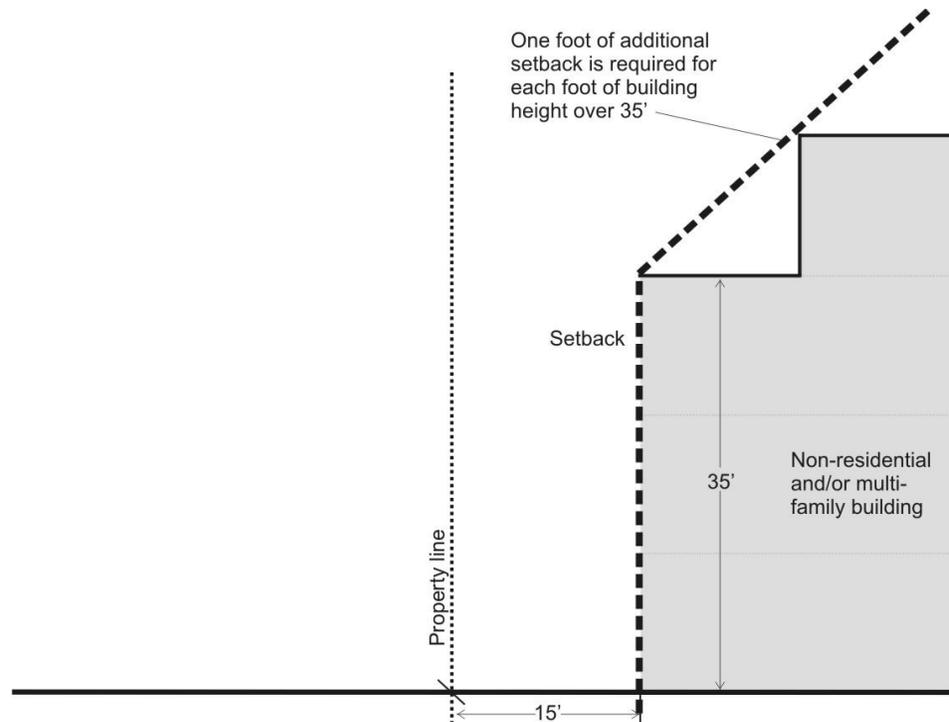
B.30.150a. Setbacks for multifamily buildings in all zones except TC-A.
